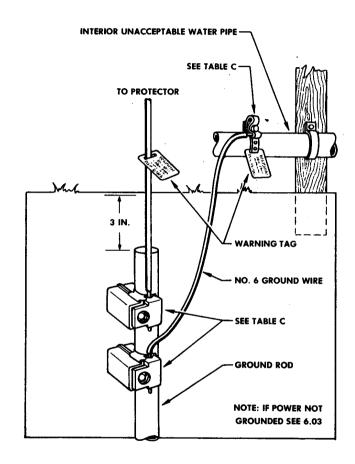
Power Not Grounded on Premises—Unacceptable Water Pipe
